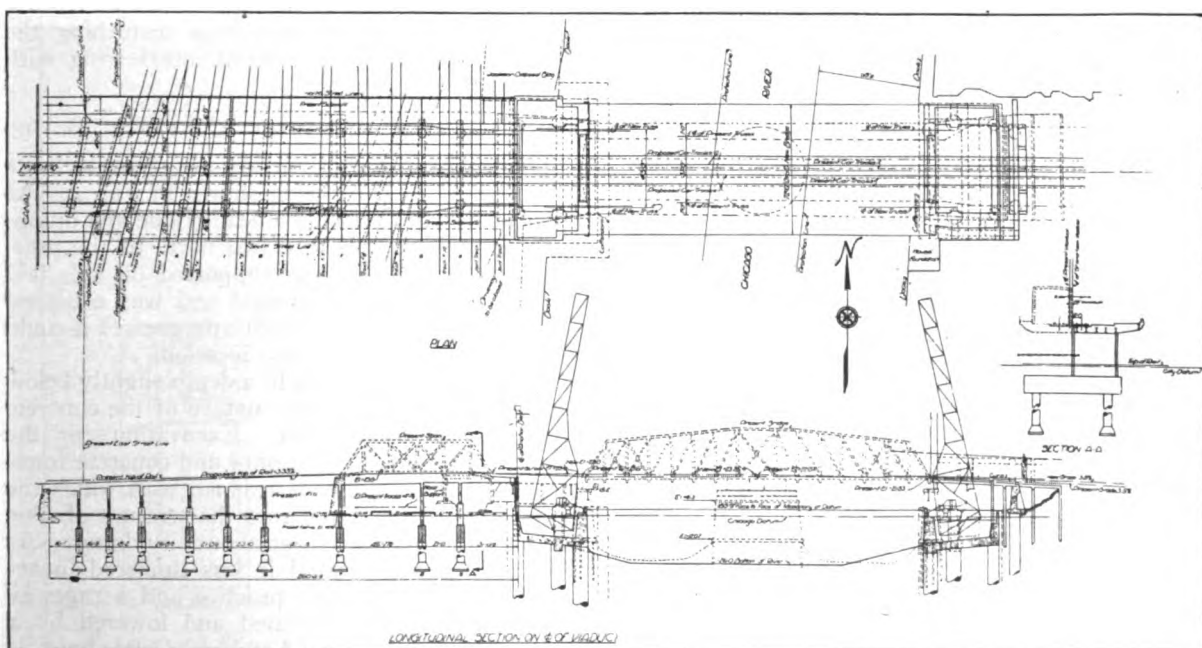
General Elevation and Plan of Madison Street Improvement Showing Location of Viaduct Substructure.
